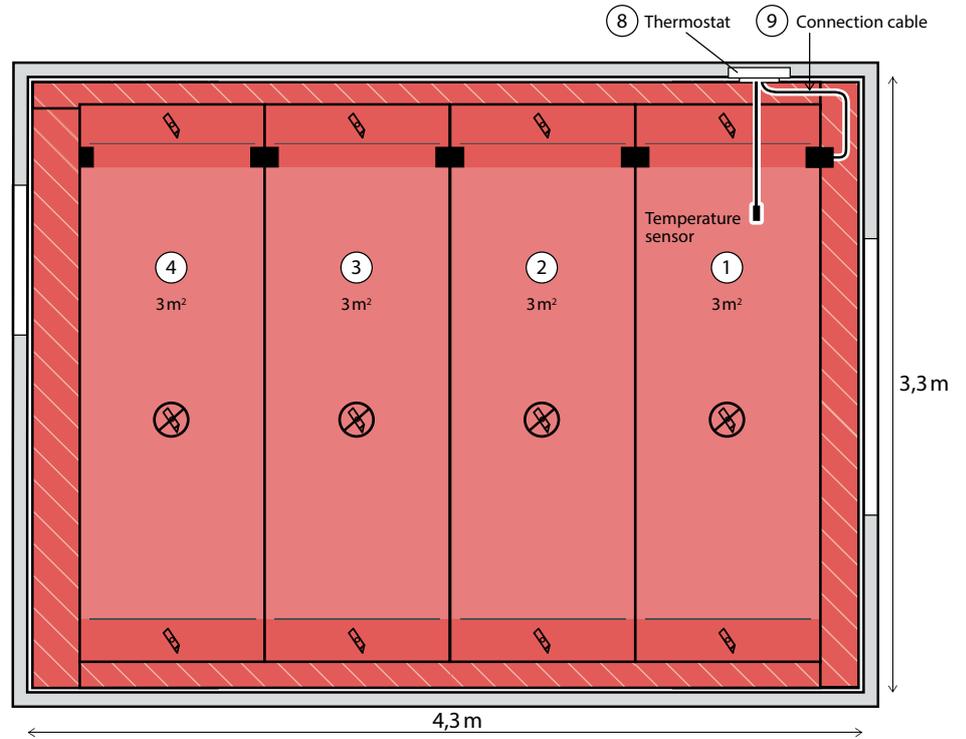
Connectors along top wall and place for thermostat installation (connection to heating elements) at top-right corner of the room.
